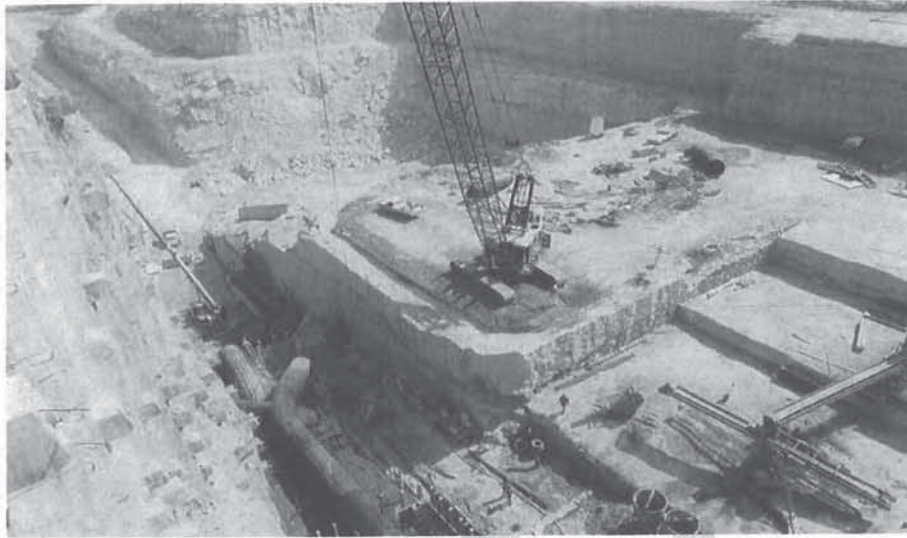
Wivenhoe Outlet and Spillway Plunge Pool Construction
